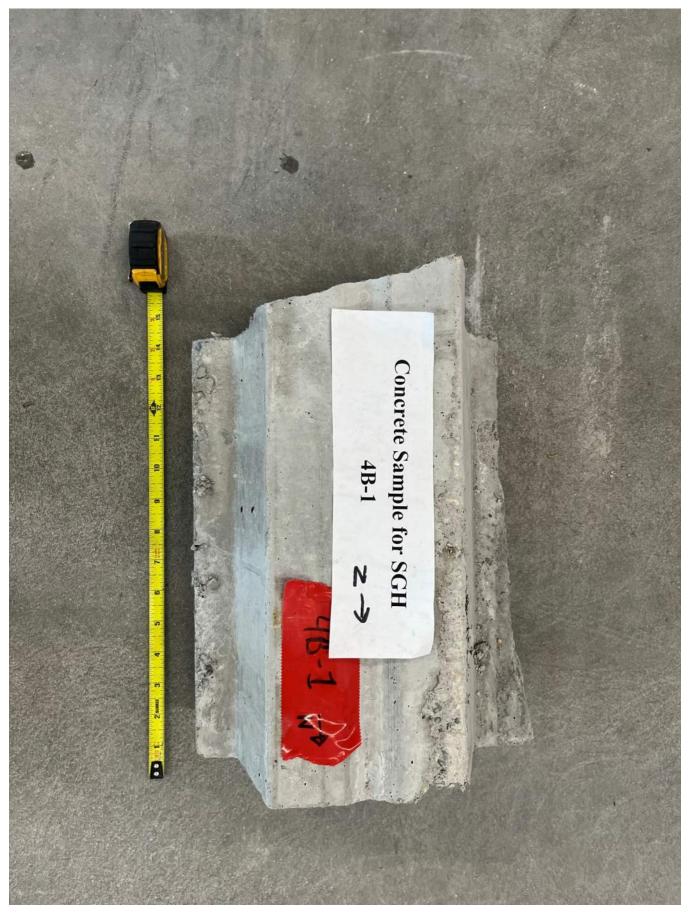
Received slab Sample 4B-1 (note direction indicated as North is actually South).
